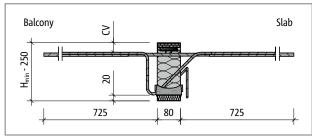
Schöck Isokorb® T type K-M7 to M11: Product section
